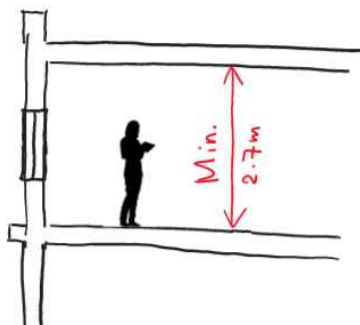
Minimum floor to ceiling heights for boarding houses and co-living housing
